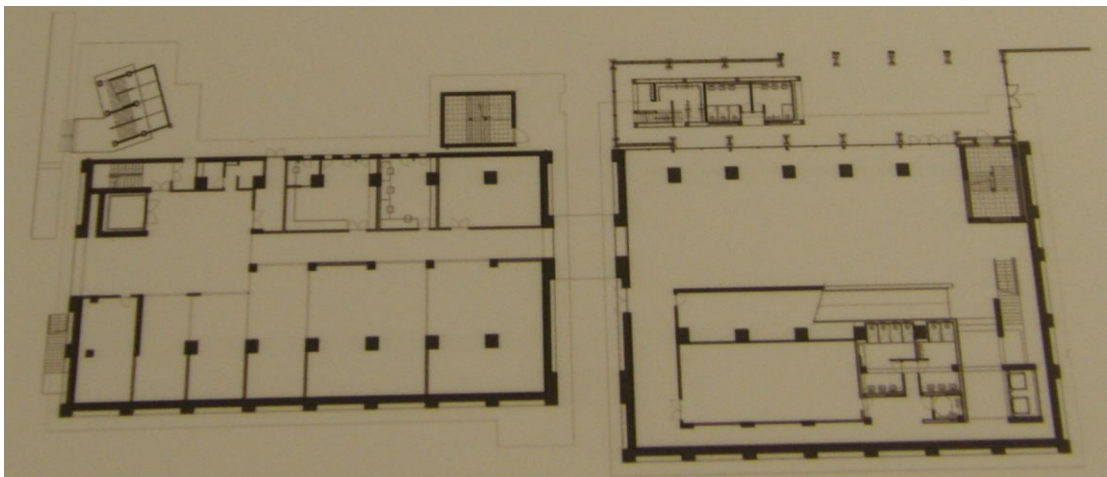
Ground Floor Plan of Santralistanbul Museum, (Bilgin, et all 2010)
